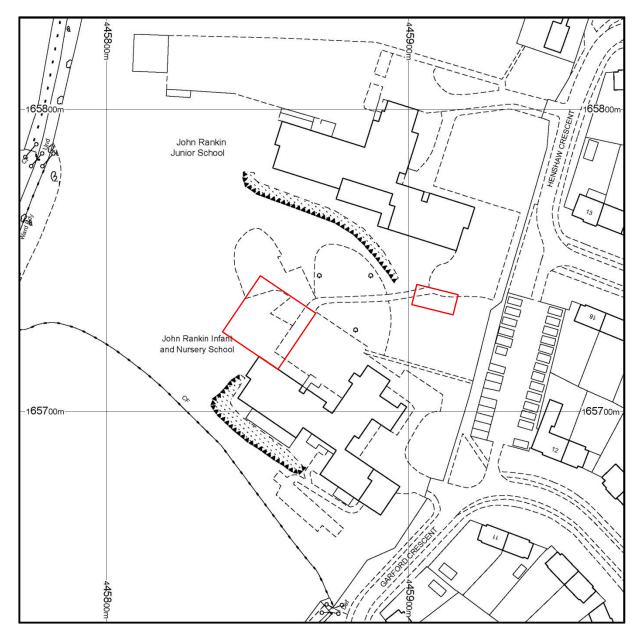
Site plan with highlighted development areas (Scale 1: 1:1250)
